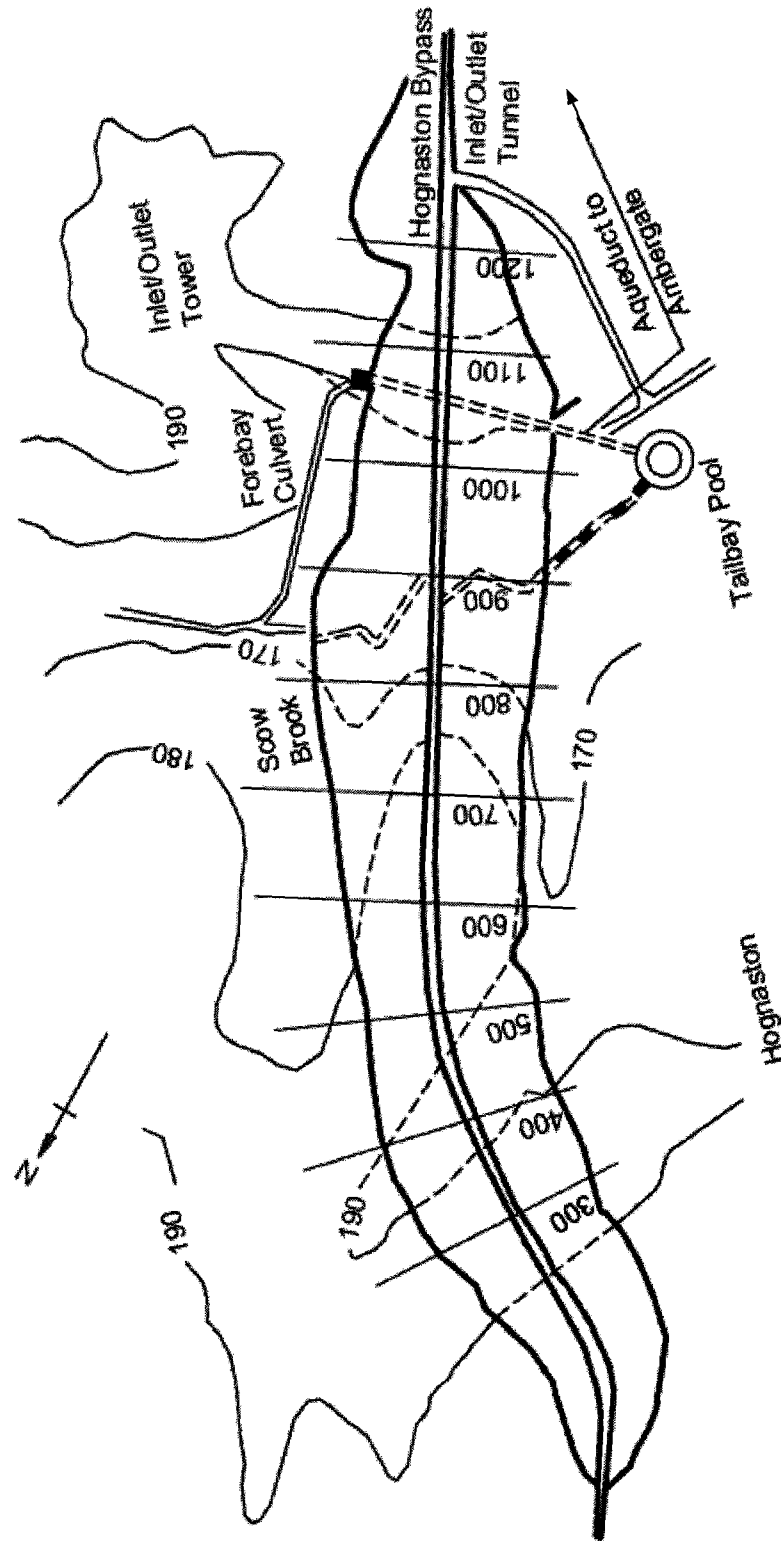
Plan of the Carsington Dam, Chen [8]
